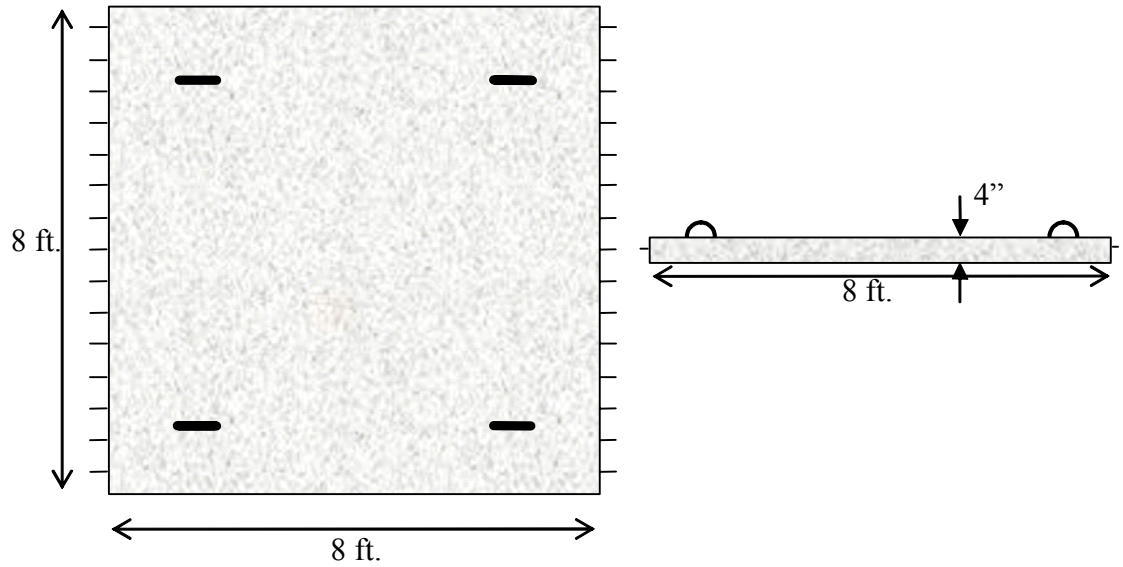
View of a typical precast concrete panel used as stay-in-place forms on the LSBDs
